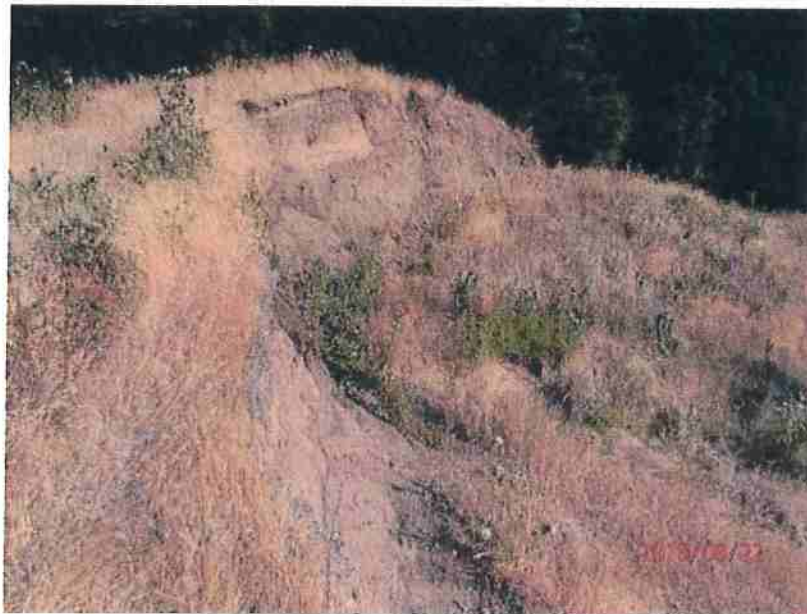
A: Outboard landing fillslope failure looking southeast from the right edge of head scarp. Note natural revegetation of bare soil areas as compared to 2016 photos.
